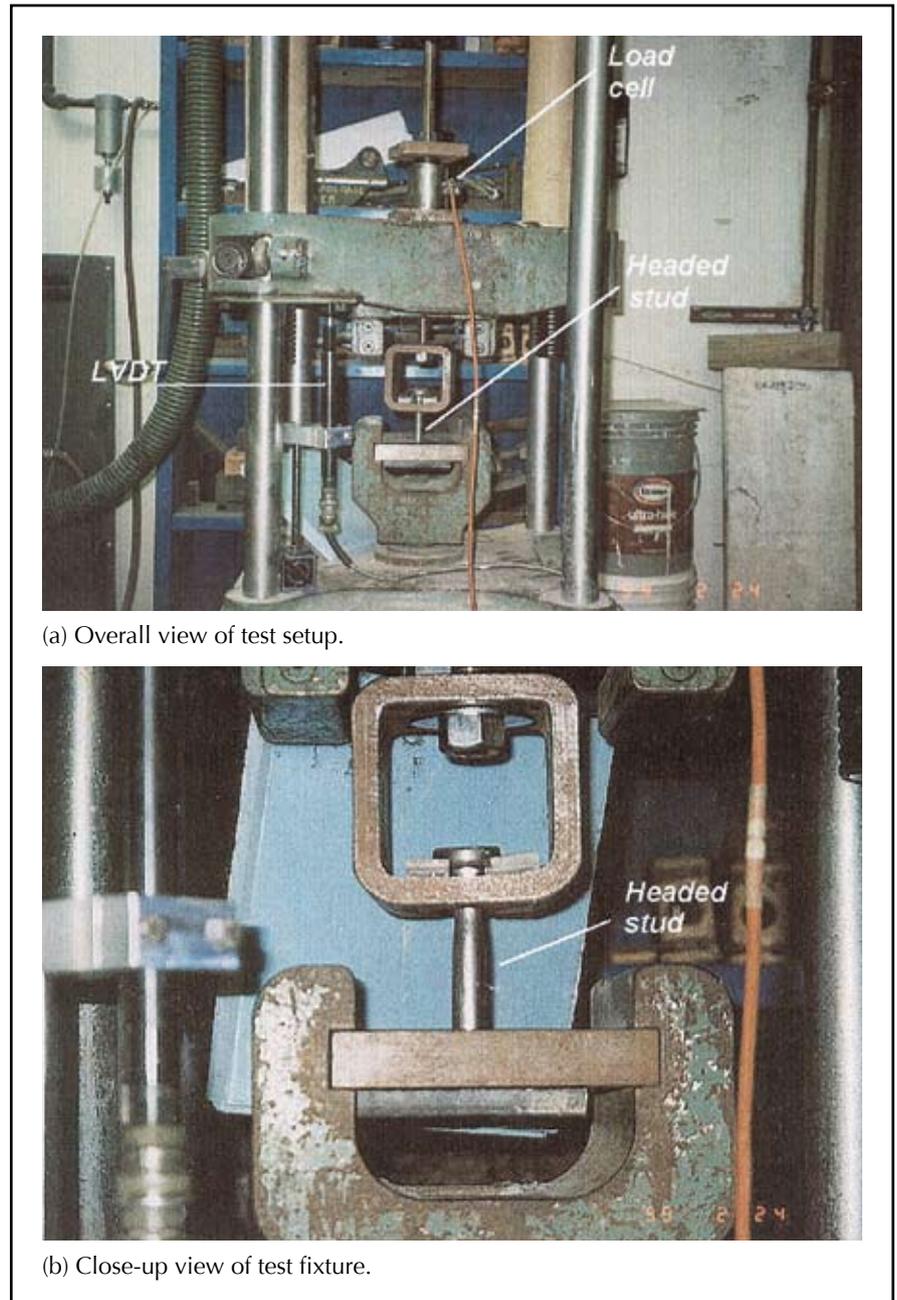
Test setup for tension testing headed studs welded to a steel plate.
